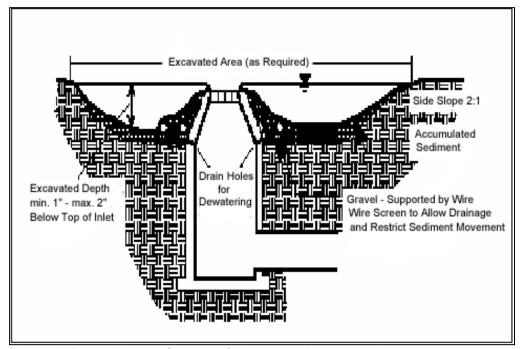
Typical Section of Excavated Drop Inlet Protection
